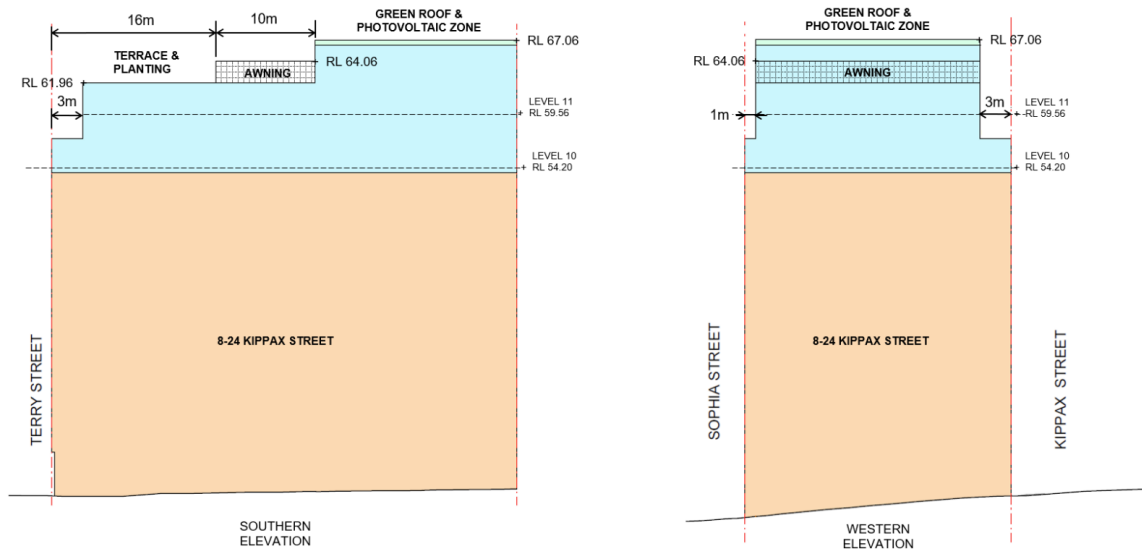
Elevations of the proposed building envelope, new additions facilitated by this planning proposal shown in blue
